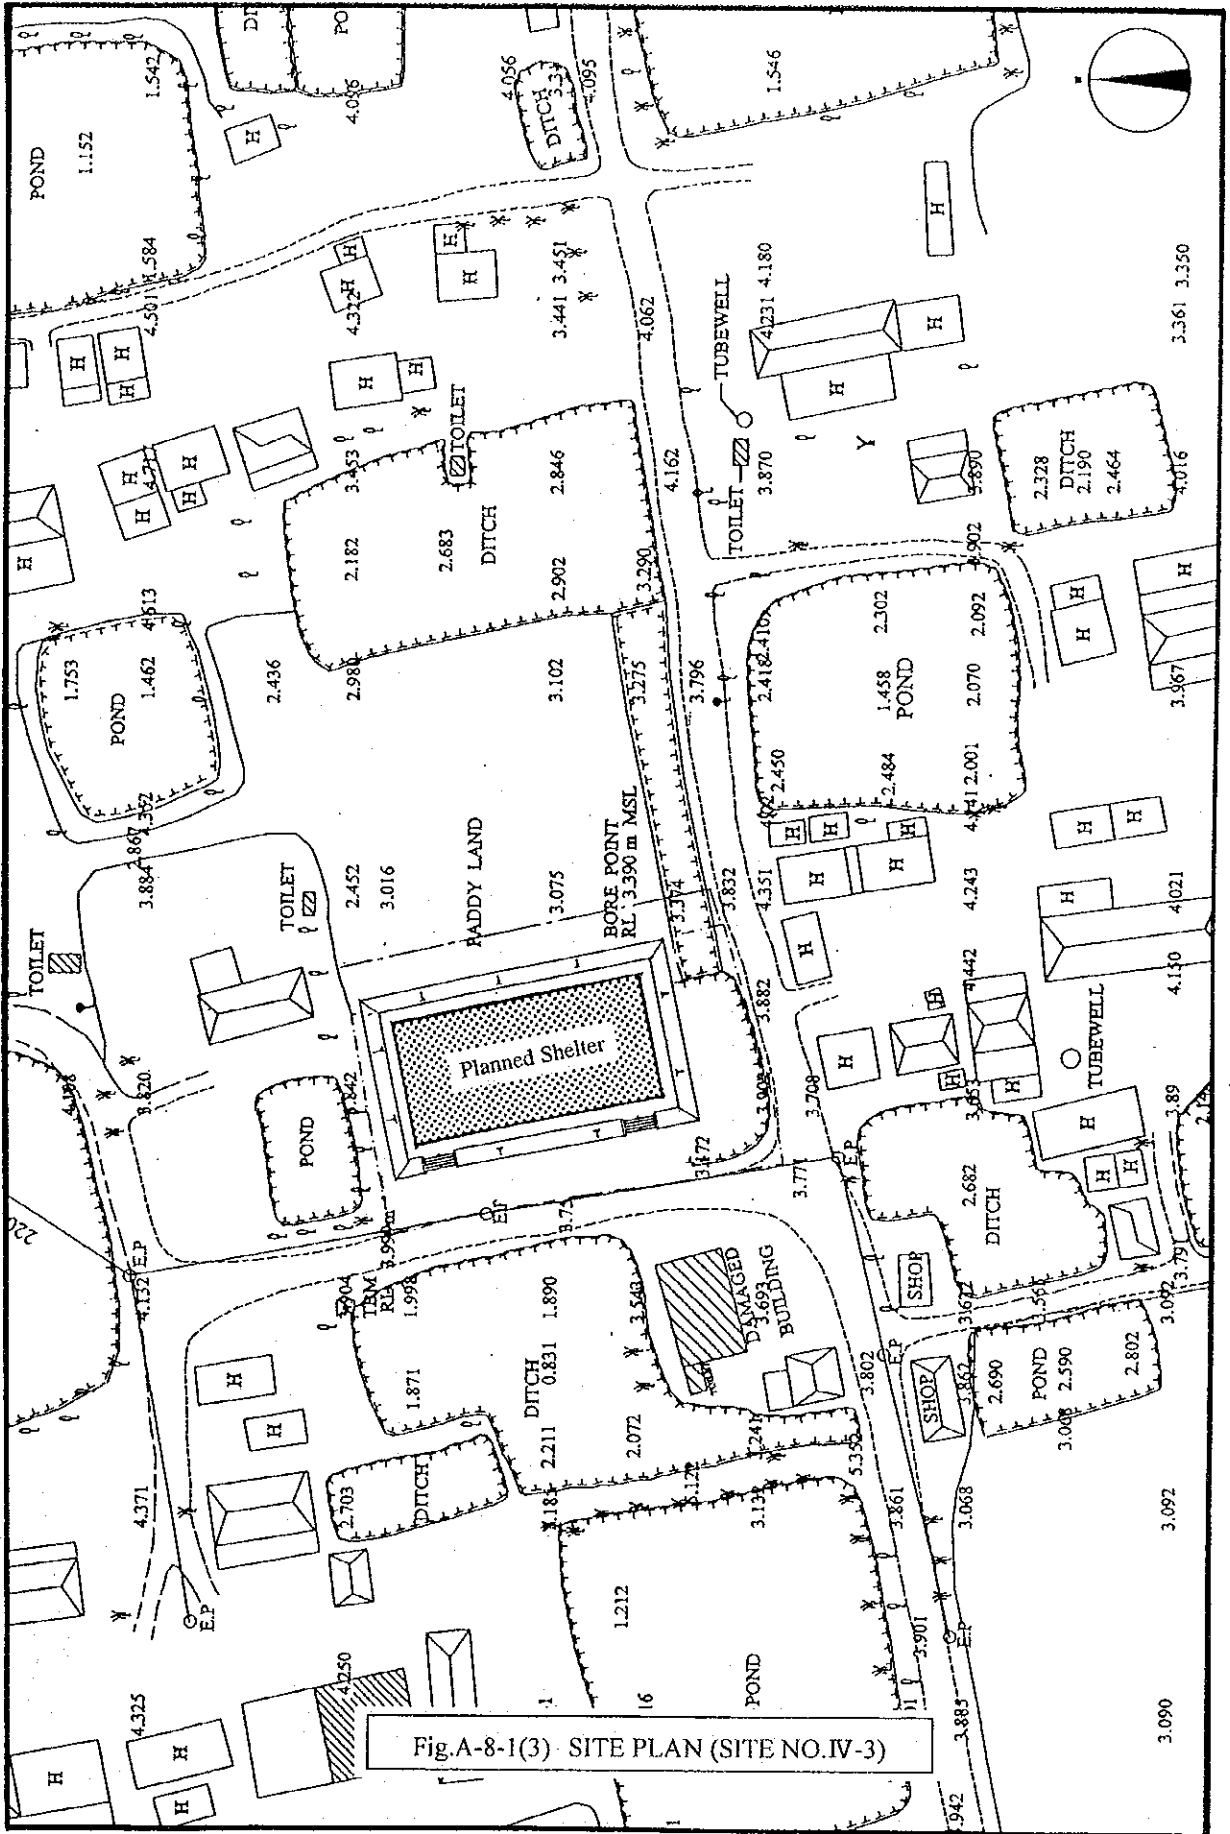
(3) SITE PLAN (SITE NO.IV-3)
